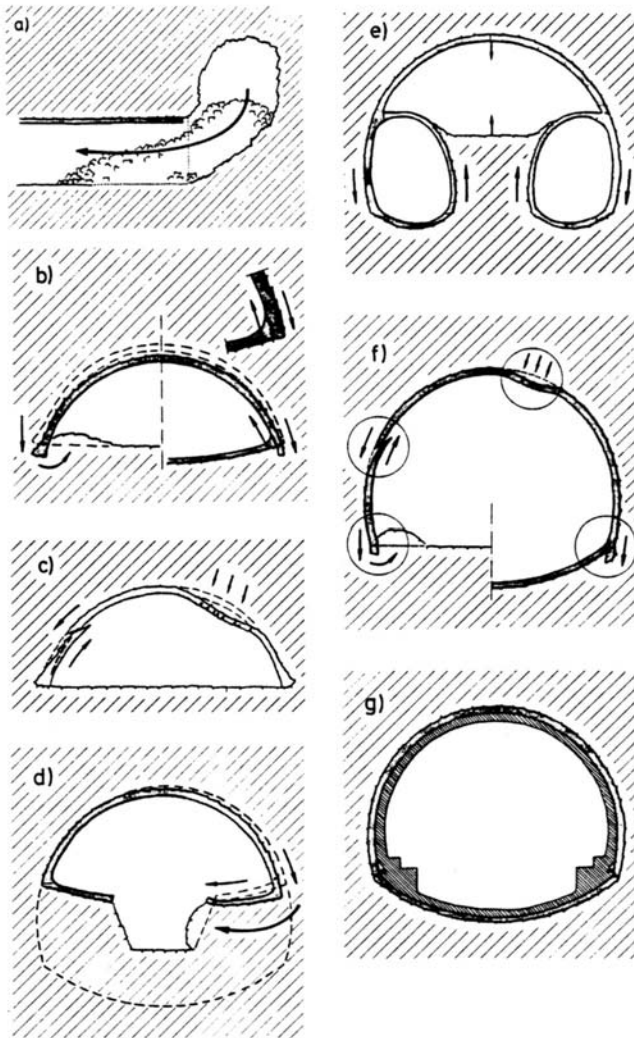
Possible cases of collapse in tunnels built with the shotcrete construction method [5]
